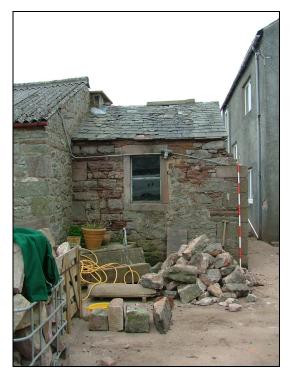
North elevation of wash-house with a possible plinth for milk churns to the left of photograph (Scale = 2m)
